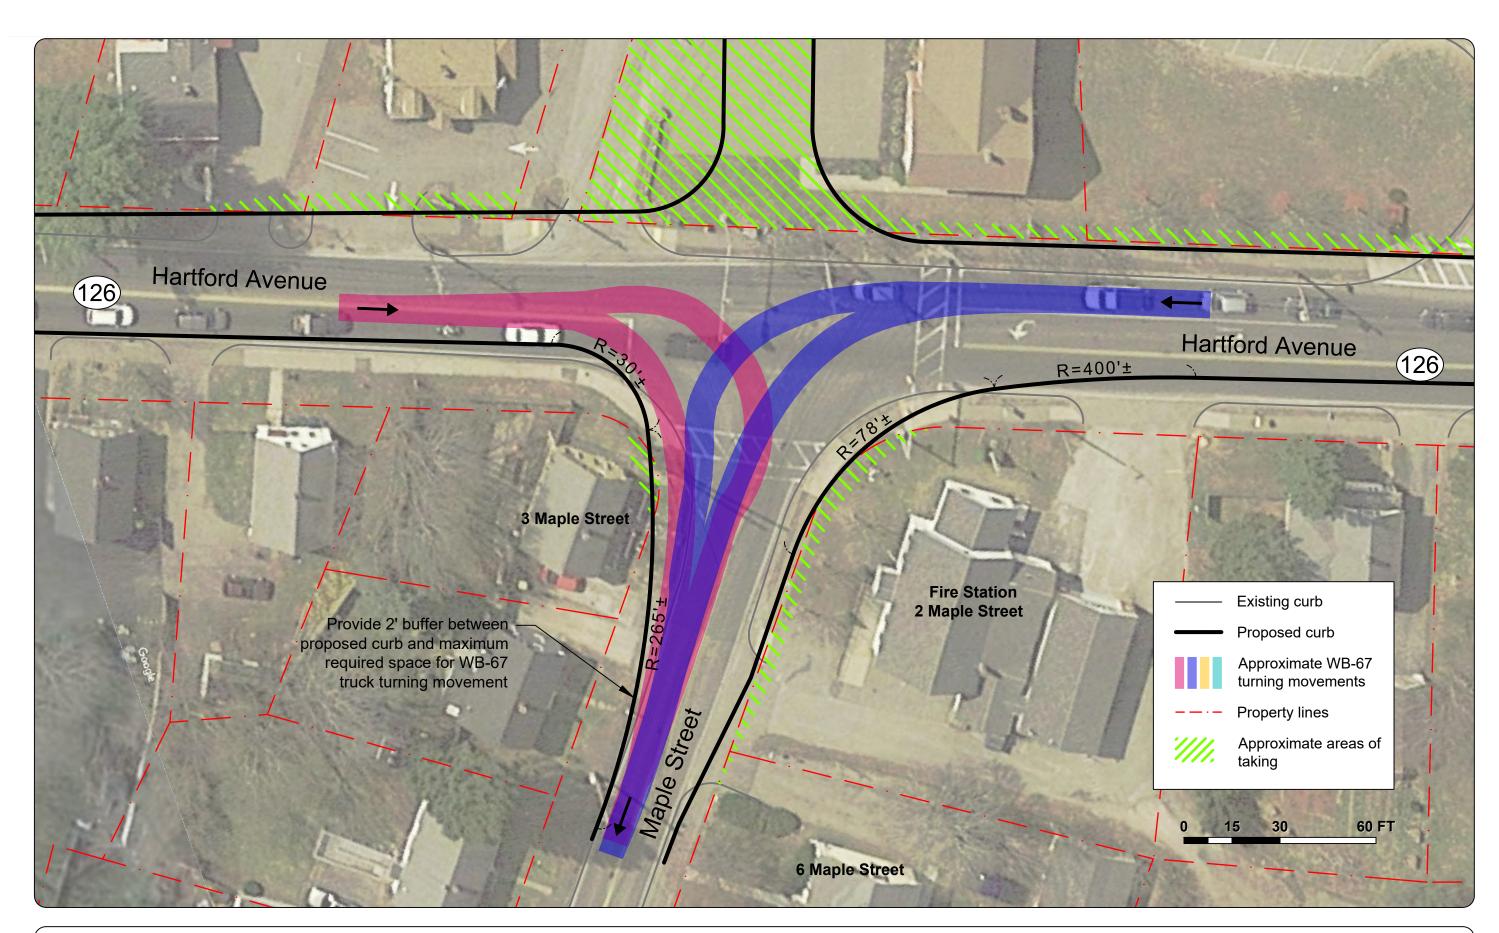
Alternative 2: Truck Paths Turning Onto Maple Street Redesign of Hartford Avenue and Maple Street Intersection
